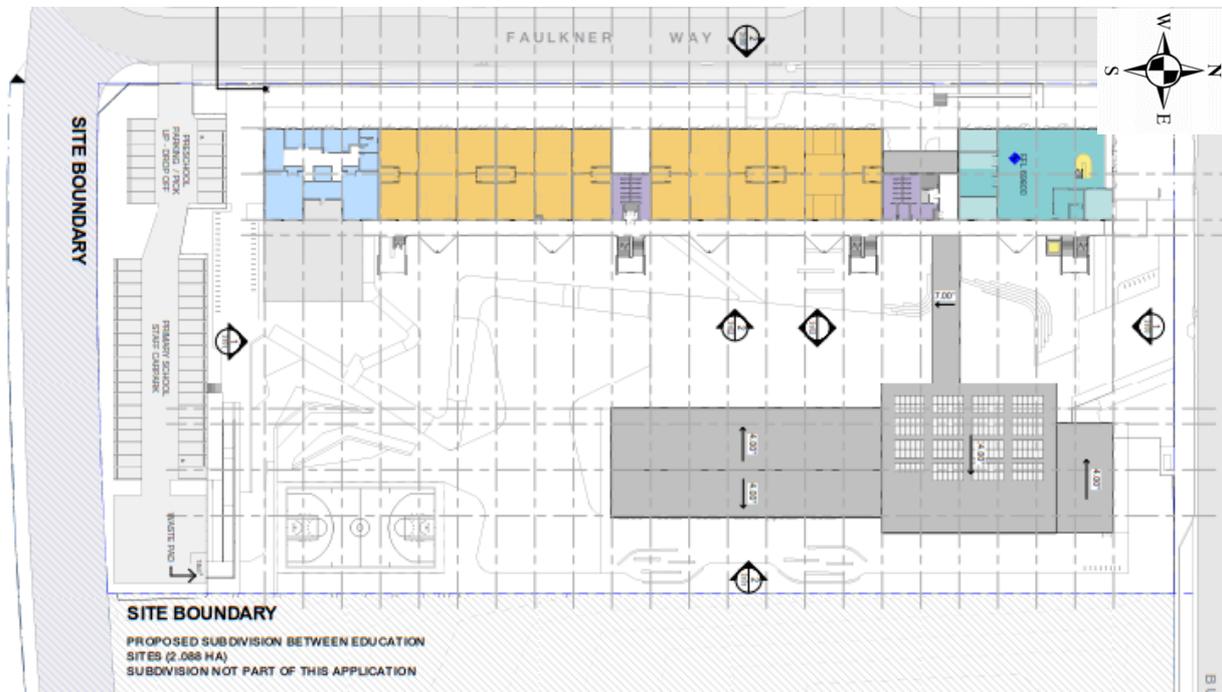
Development Proposal Site Plan (Source: TKD Architects)
